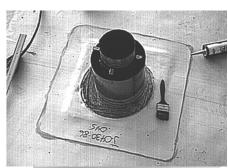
Flashing Detail for an Insulated Rubber Roof
